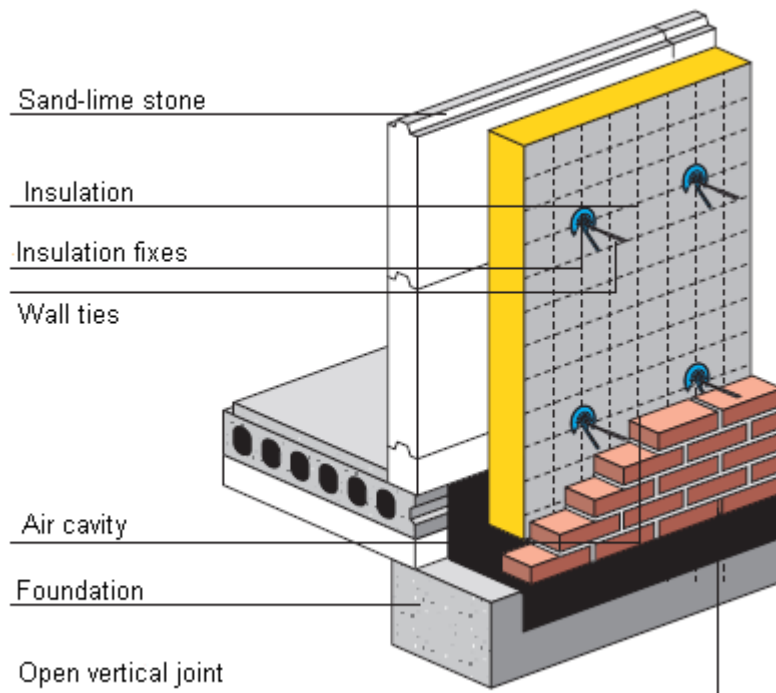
, cavity wall (Adjusted from: Isover, 2008)
